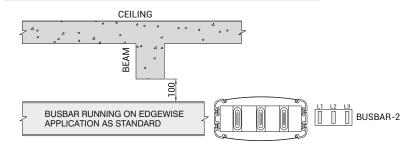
CROSSING UNDER A BEAM ON EDGEWISE APPLICATION
